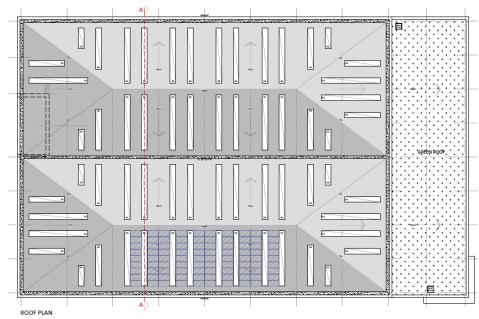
Proposed roof plan showing the extent of proposed photovoltaics and green roof.
